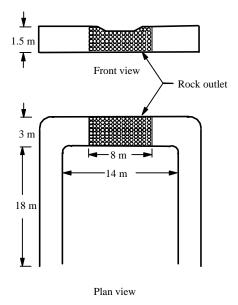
Plan and front (looking upstream) views of the Carpenter 1 trap.
